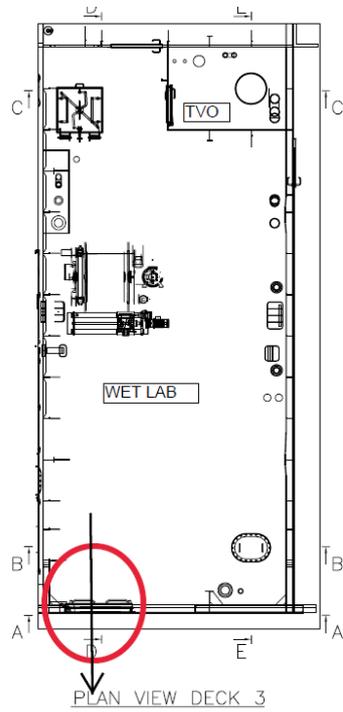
Layout of the wet lab with position of the shell door for direct sea water access
